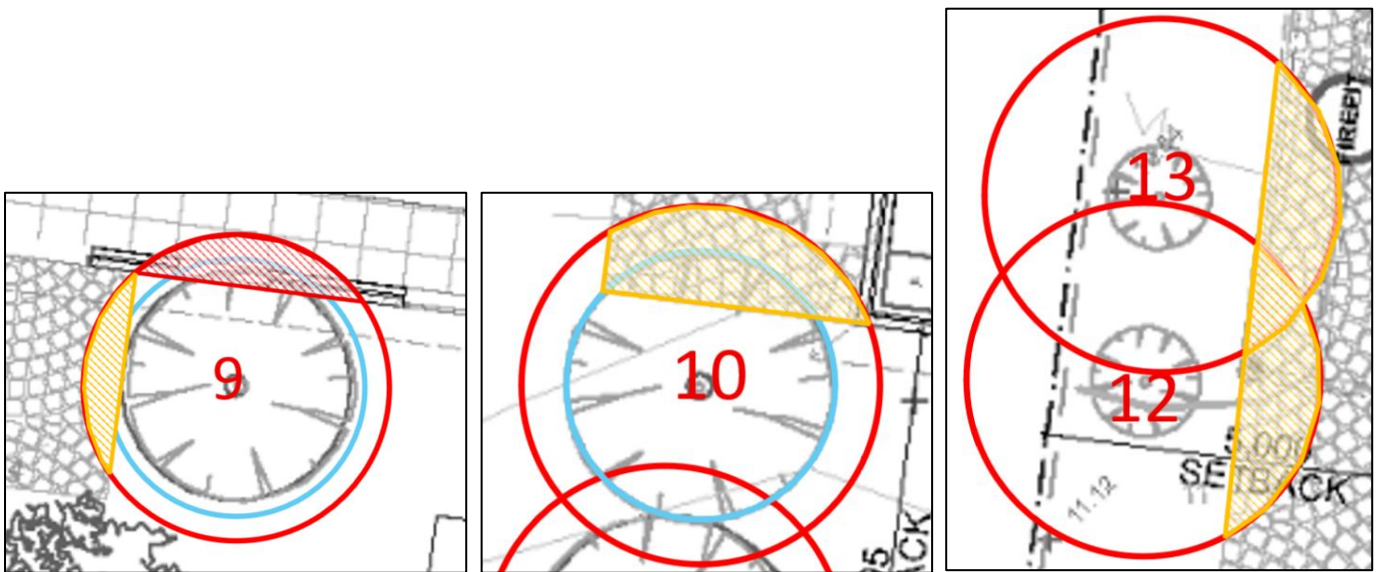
4 trees/shrubs that are proposed to be retained but have shallow or deep excavations proposed through mainly landscaping purposes.
